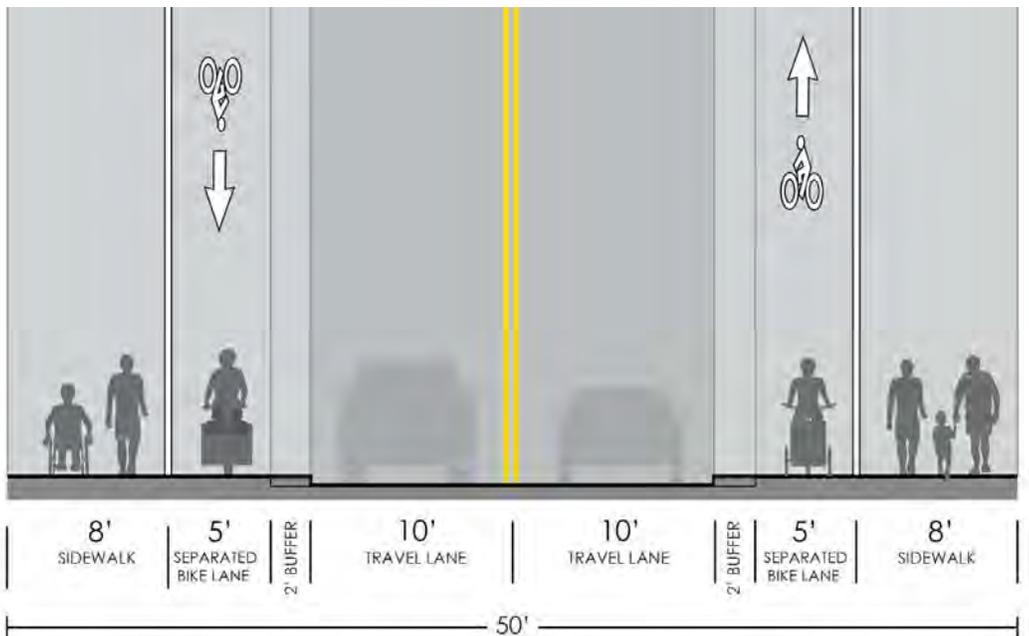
Section C: Street Section for southern end of Arcadia Avenue.
